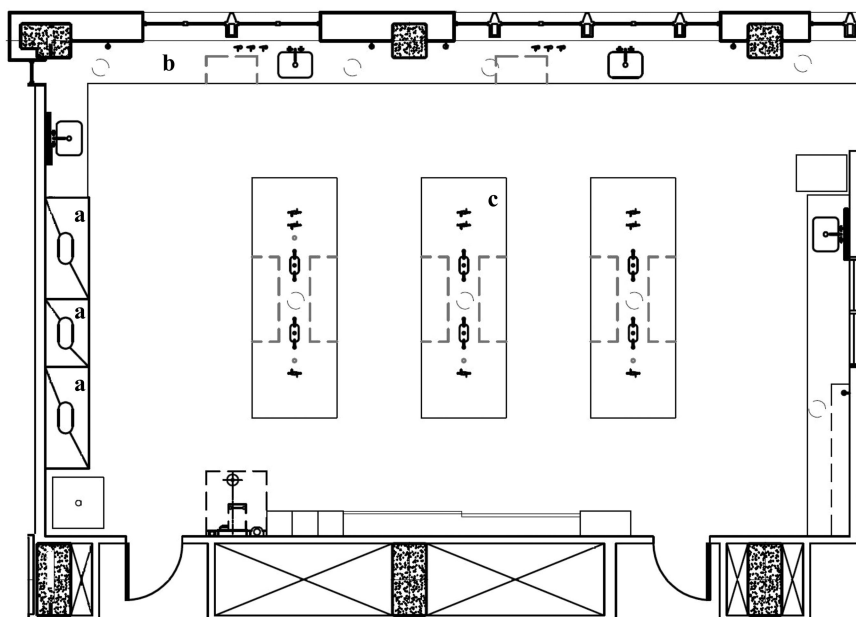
Laboratory layout for chemical synthesis. (a) Two six foot and one four foot hoods occupy one interior wall, (b) exterior wall comprised of large windows, and (c) fixed lab benches provide work surfaces and storage.
